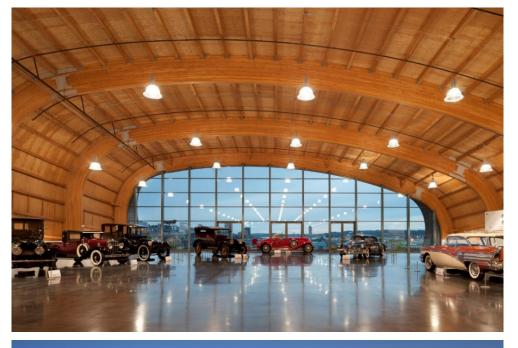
GLT beam and plywood ceiling cladding - LeMay Museum, Tacoma / ABD (LeMay Museum / LARGE Architecture, 2024)
